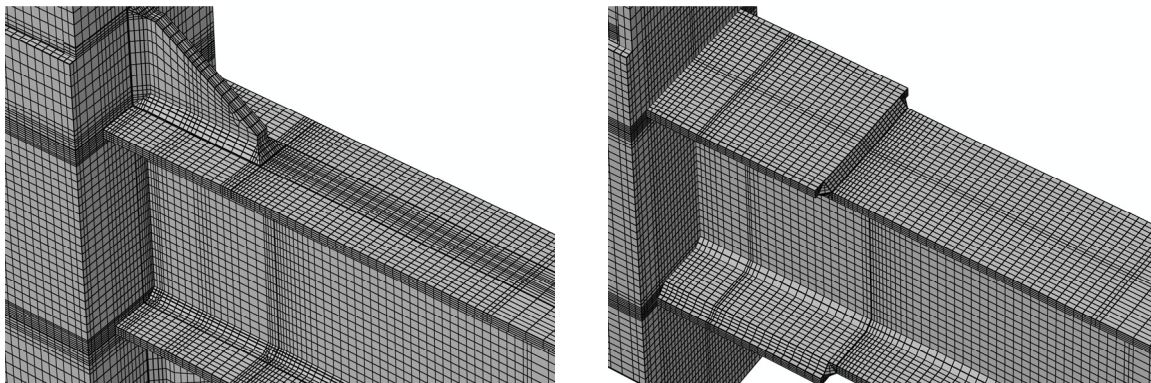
Details of steel joint components of RS and CP beam-to column joint finite element model
